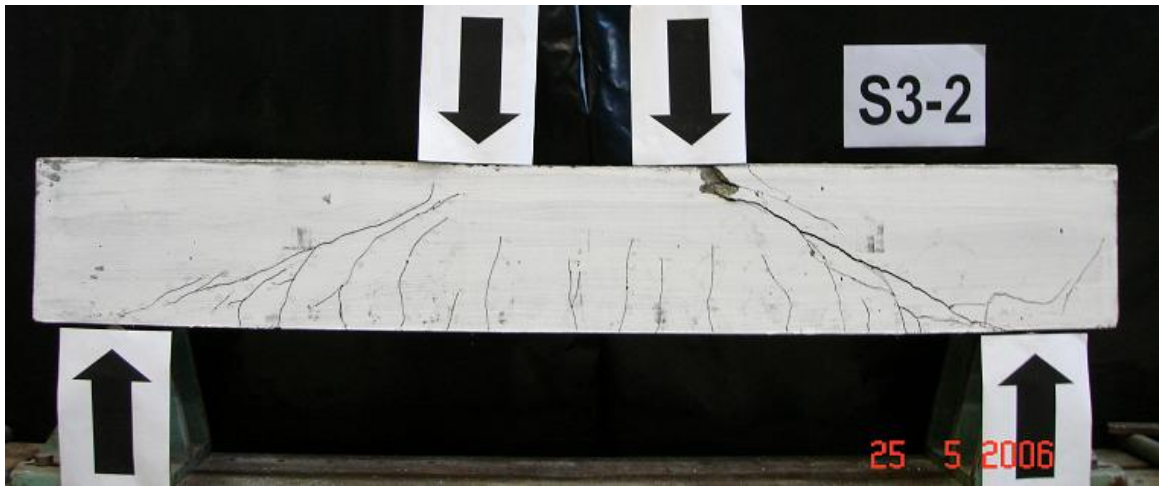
Overall Crack Pattern for Beam 3-2 (Back Face)
